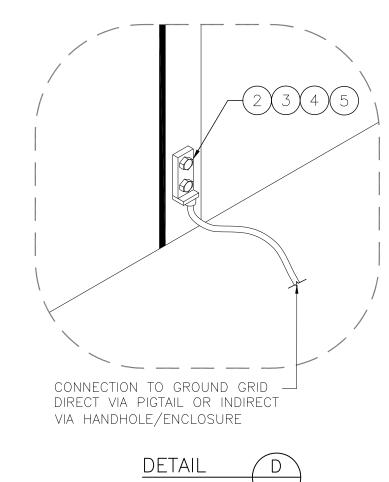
GROUNDING CONNECTION TO FIXED METALLIC RENCH
